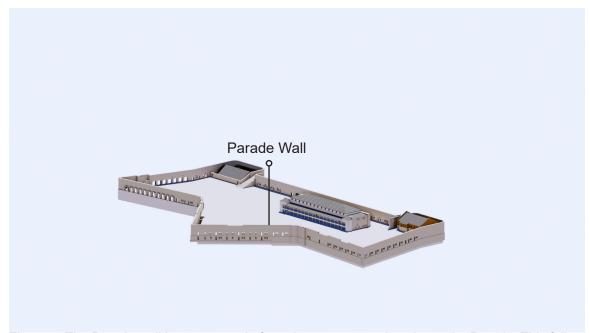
The Parade wall in constructed of granite masonry and encloses the Parade. This fully connected wall system is perforated with windows and doors.
